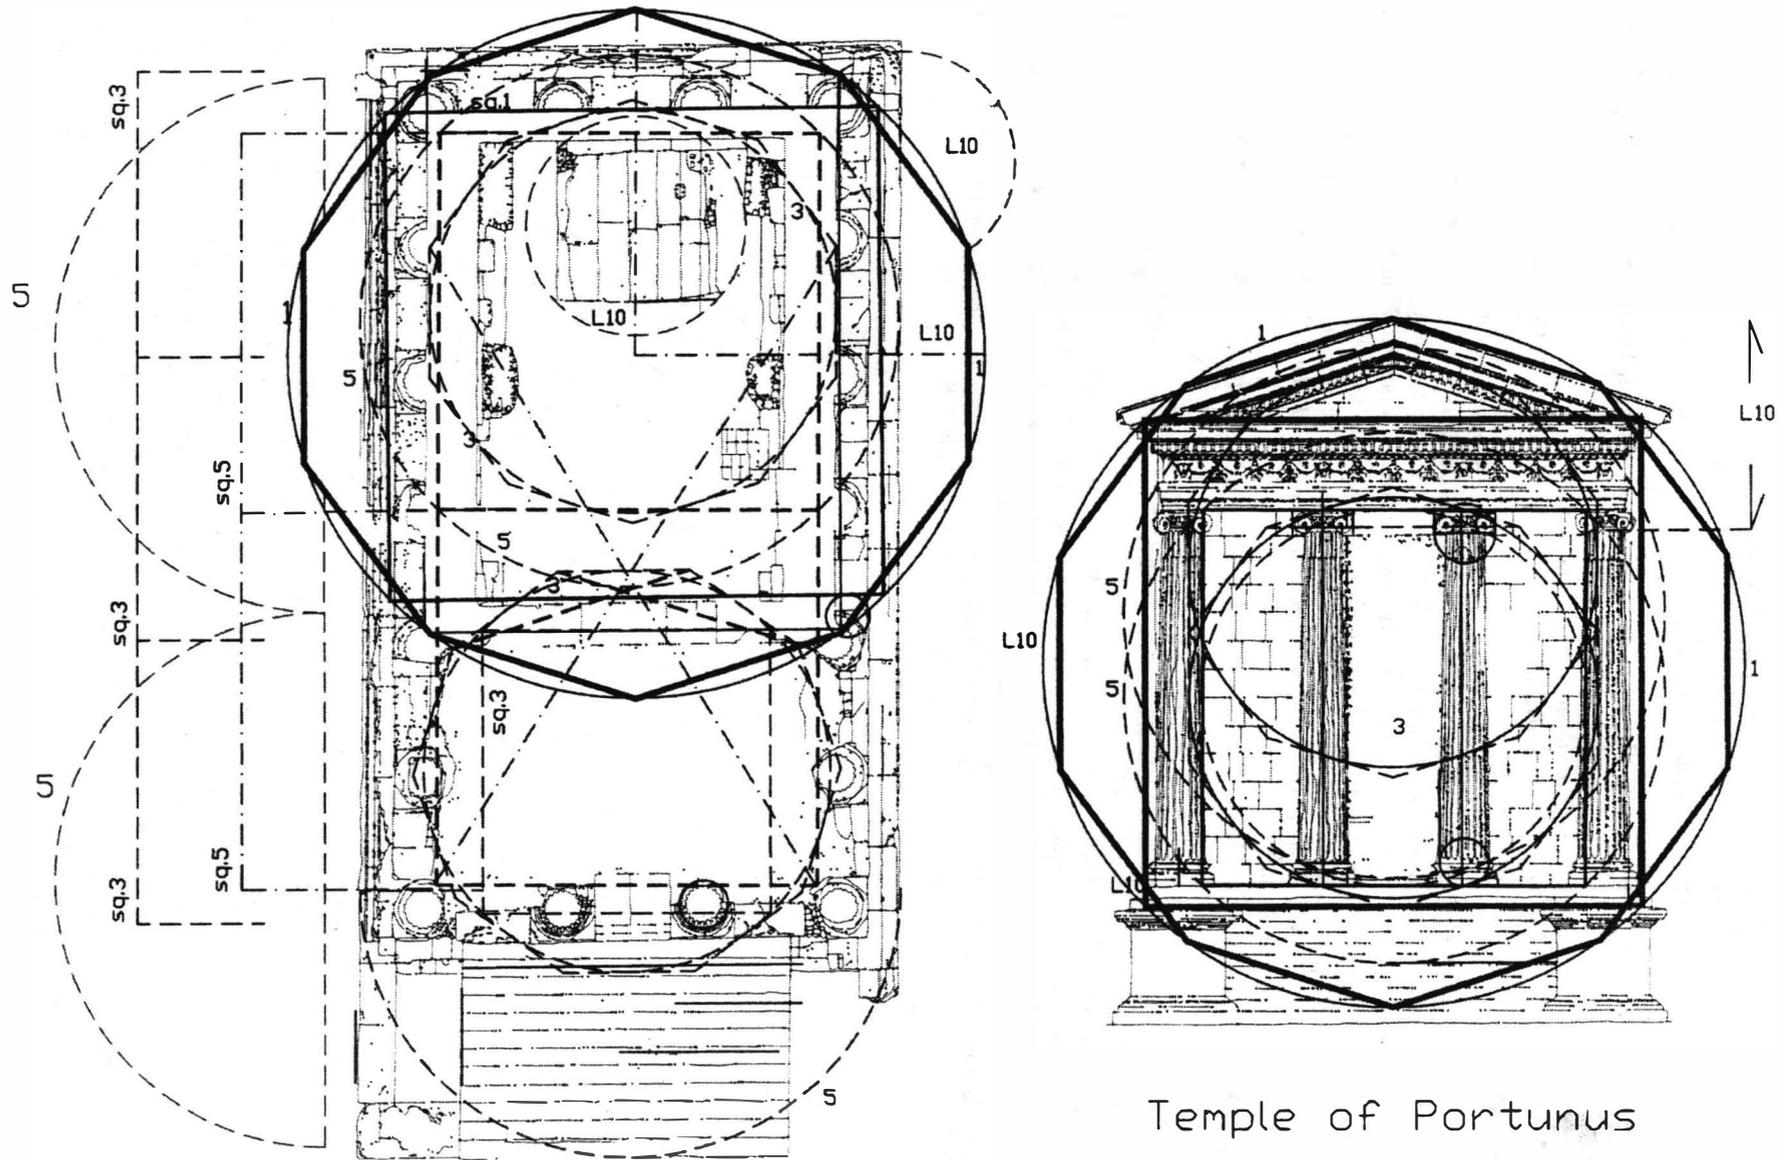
Temple of Portunus (geometric support): plan and elevation.
